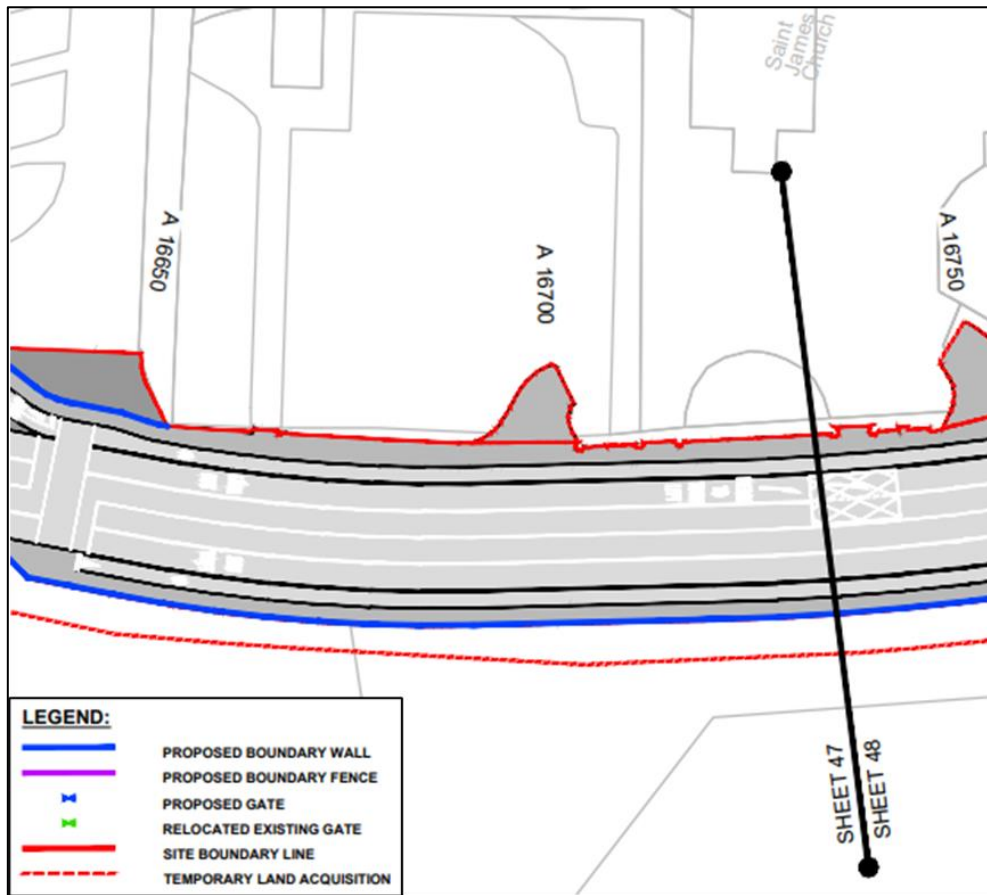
Extract from Fencing and Boundary Treatment Drawings at Dublin Road (Sheets 47)
